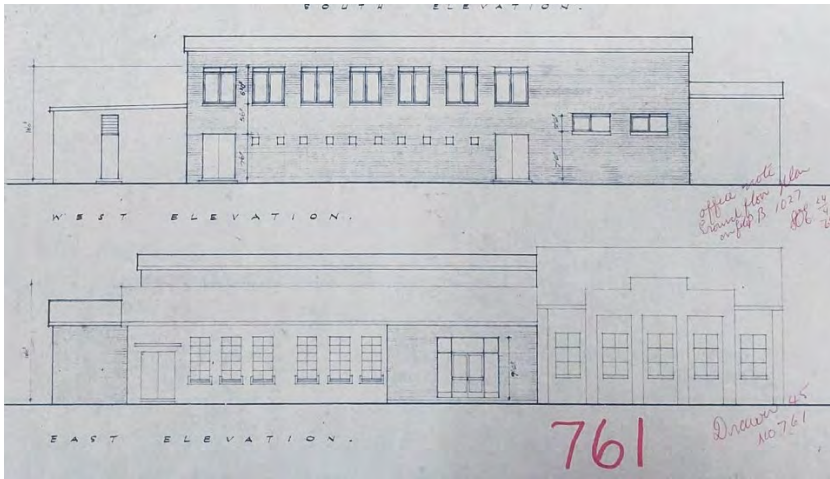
Elevation drawings dated December 1966, showing the additions (hatched) to the kindergarten hall and memorial hall, by architects Perrott, Lyon, Timbrock & Kesa (Source: PROV, PB File)
